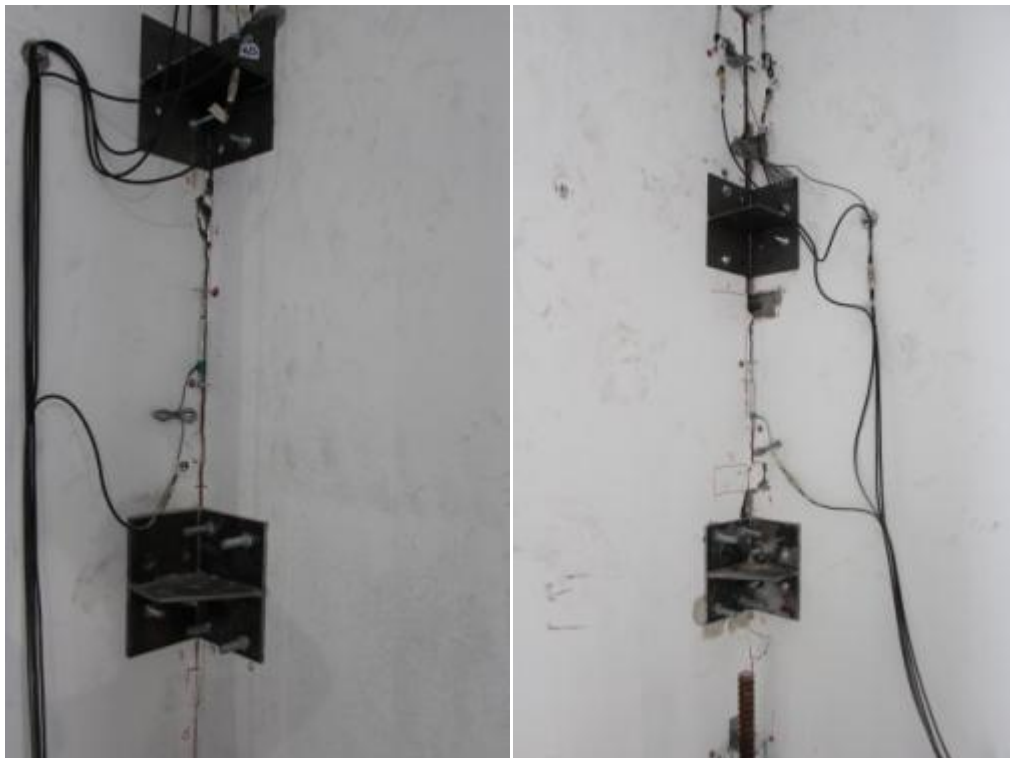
EUC-BUILD4 “retrofitted” specimen – Detail of steel angles, East and West side, first floor.
